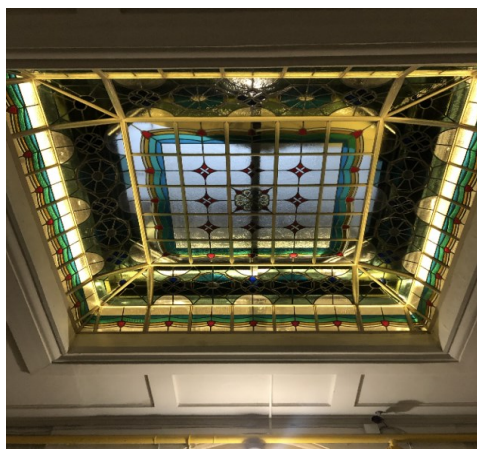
Restored stained glass window on the second second-floor in the entrance space of a residential building located at 26 K. Levitsky Street, Lviv.
